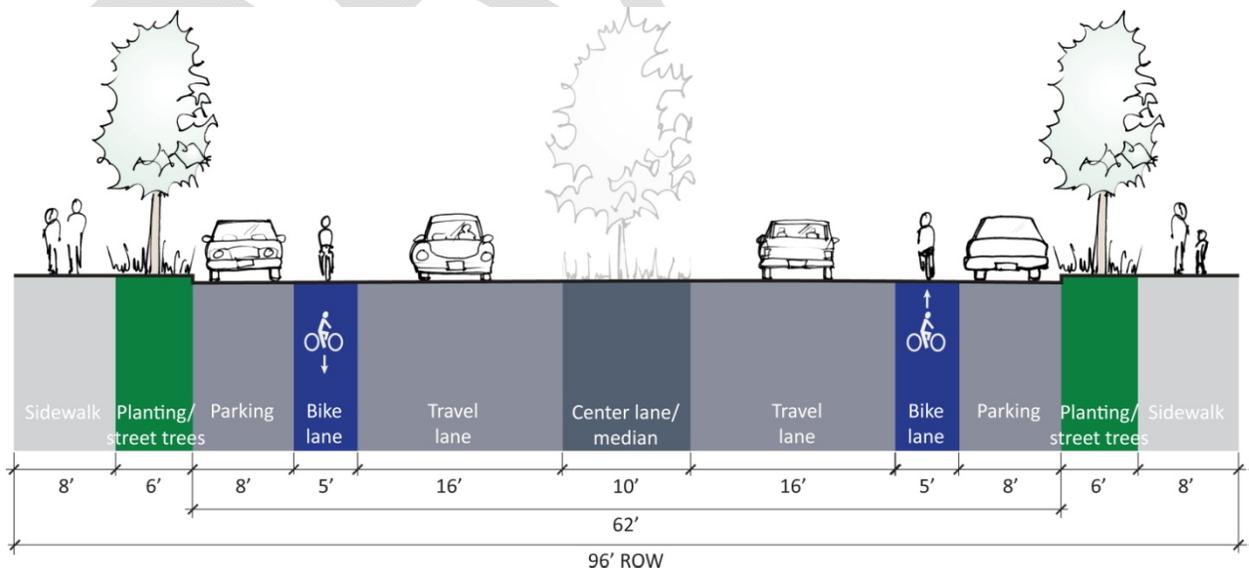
Arterial street design standards, cross-section illustrating bicycle lane, planting strips, and sidewalk widths.
